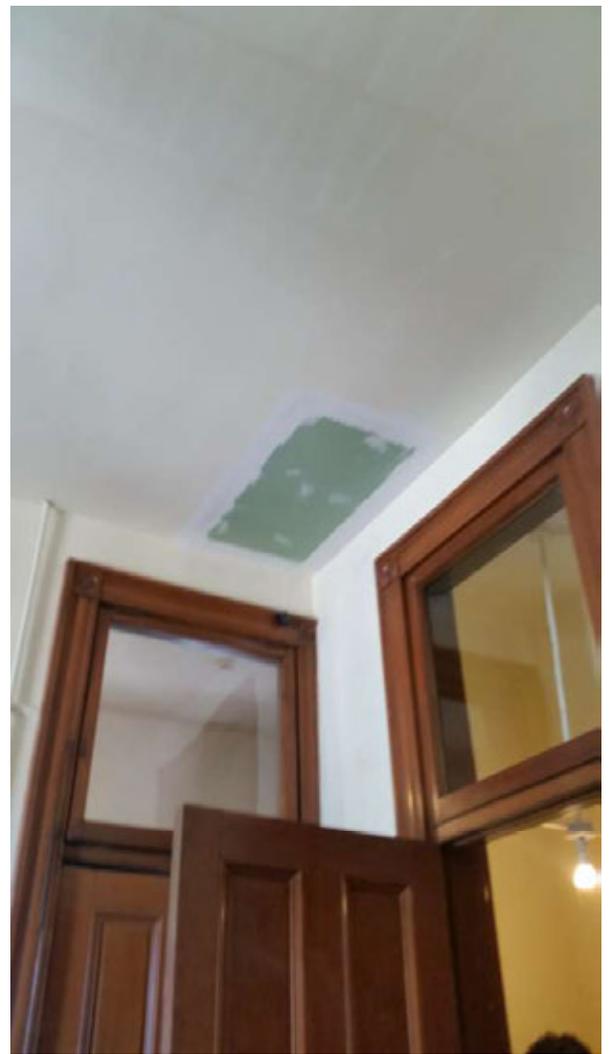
Exhibit B - View from stairwell up towards main hallway. Plaster and drywall is cracking, missing, and deteriorating further.
